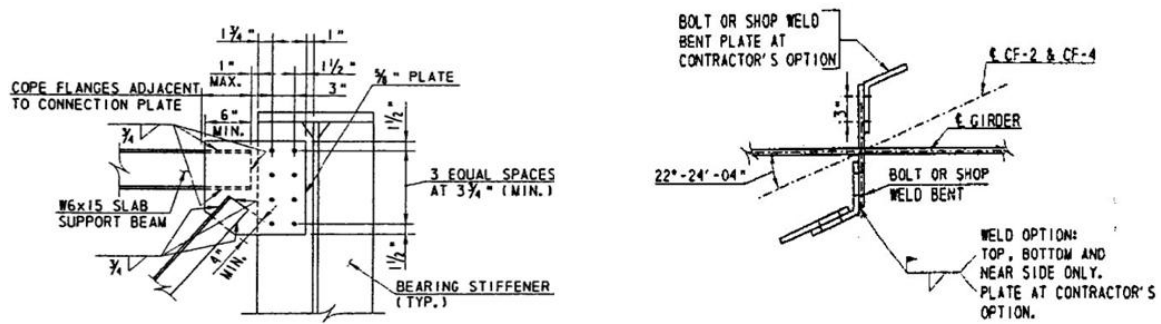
Cross Frame to Web Stiffener Details (a) Elevation View (b) Plan View
